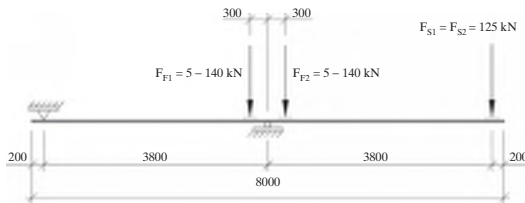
Test setup for fatigue resistance test of concrete keys (Units: mm)
